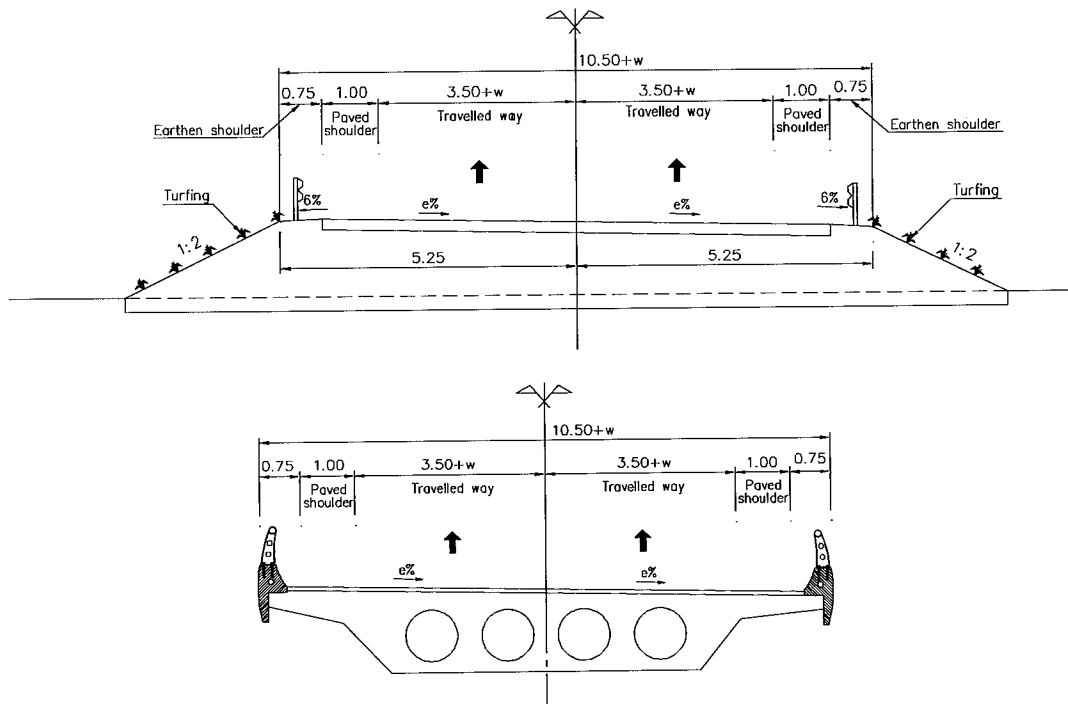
Typical Cross Sections of Interchange Ramp Way (1 Direction 2 Lane)
